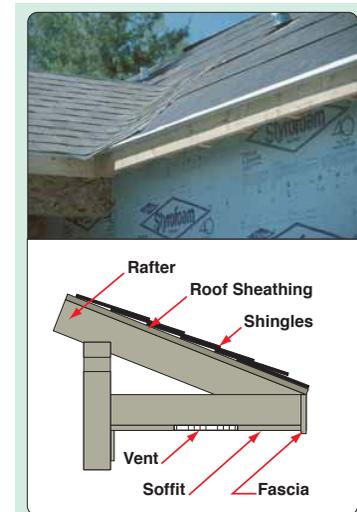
These are the parts of a finished roof. The photo shows asphalt shingles being installed on a new roof.
